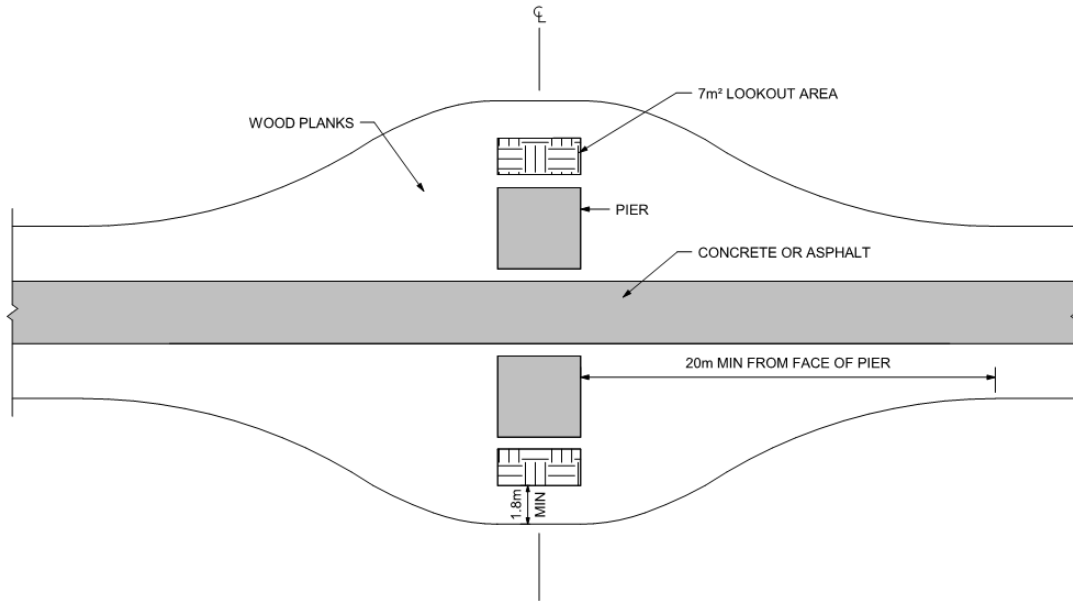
B: Tawatinâ Bridge North and South River Pier Lookout Areas
